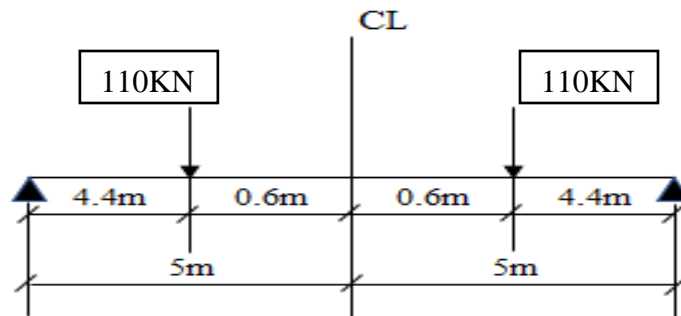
Position of tandem load for simply supported 10m slab bridge
